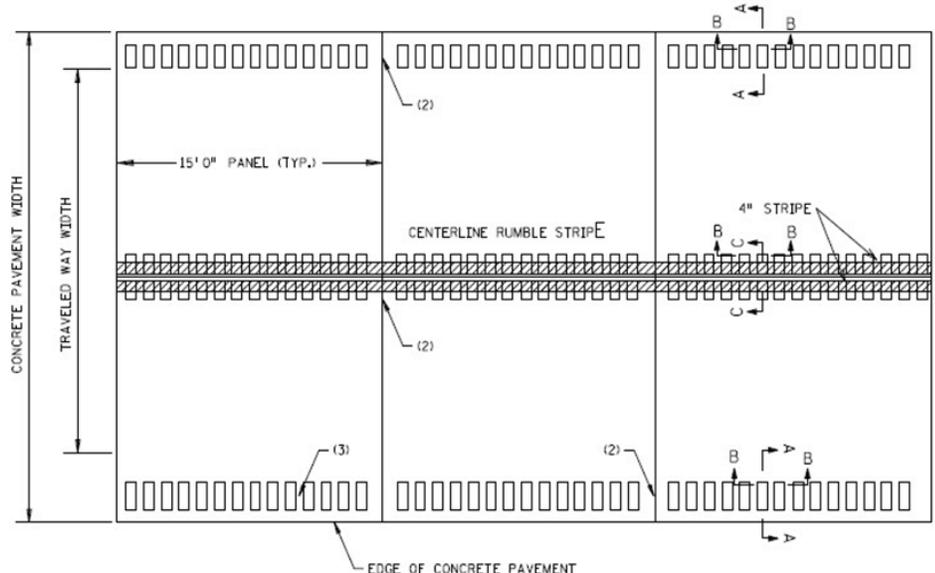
CONCRETE PAVEMENT OPTION B - CONCRETE RUMBLE STRIP
